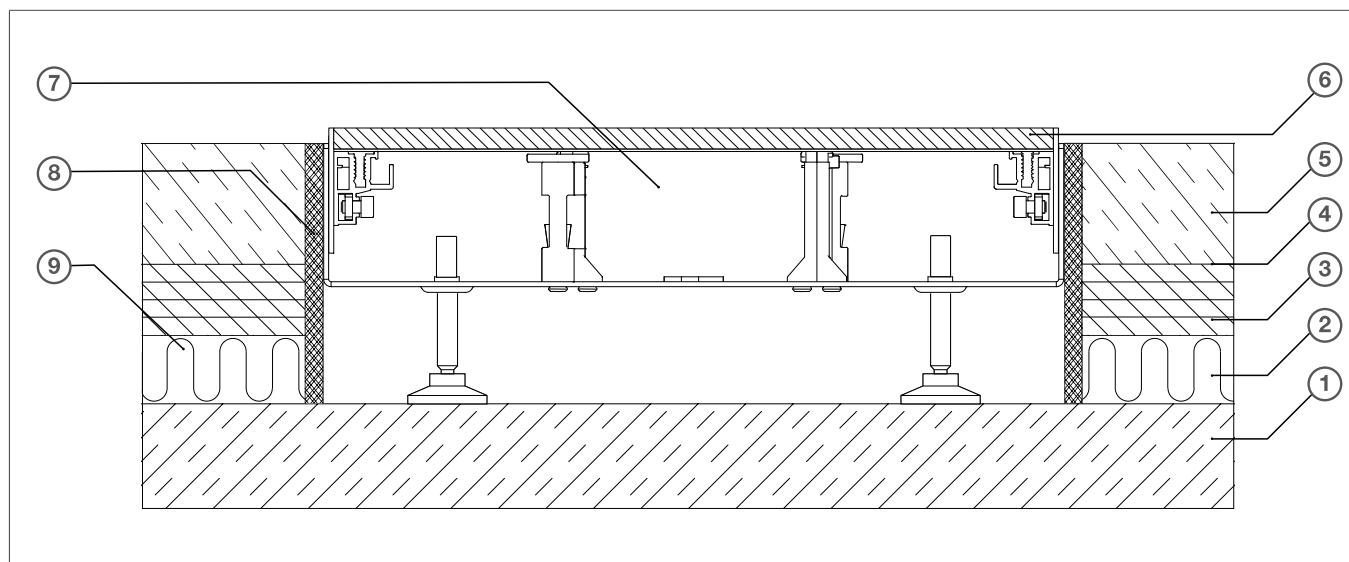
Concept drawing of the test setup for the BKGx floor trunking on the ceiling test station
